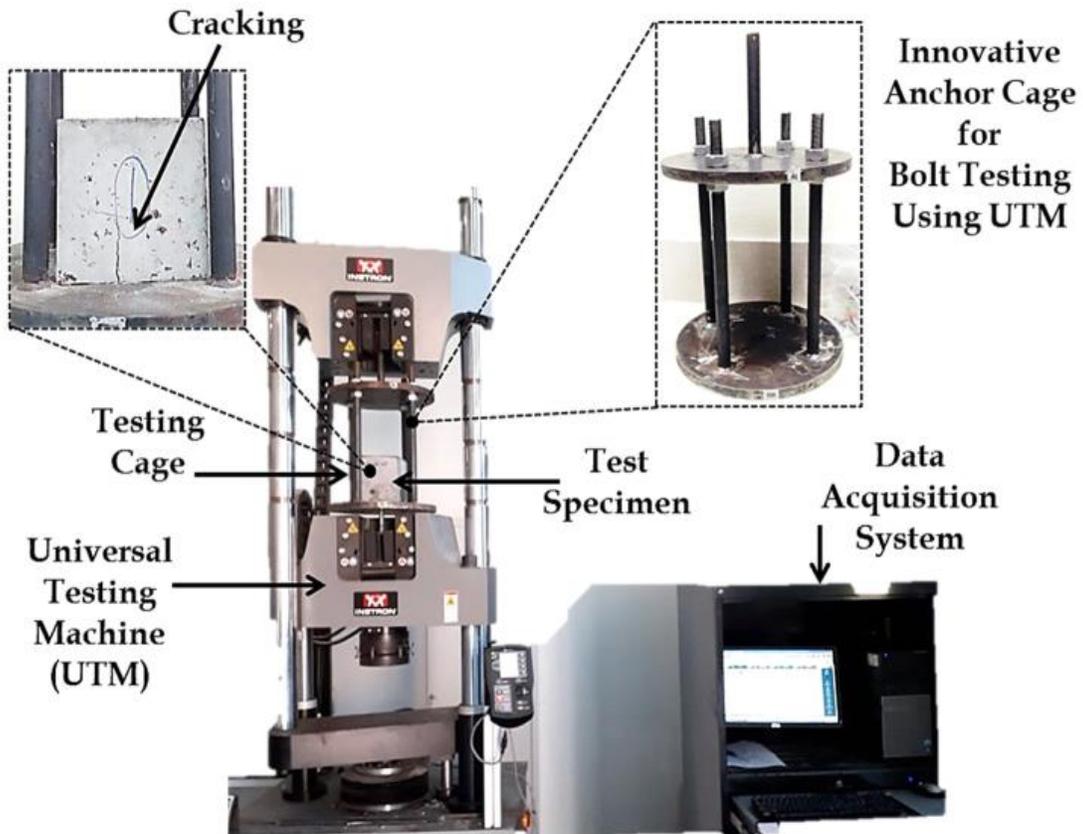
The test setup and anchor cage employed for the execution of pull-out testing with the Universal Testing Machine [5].
